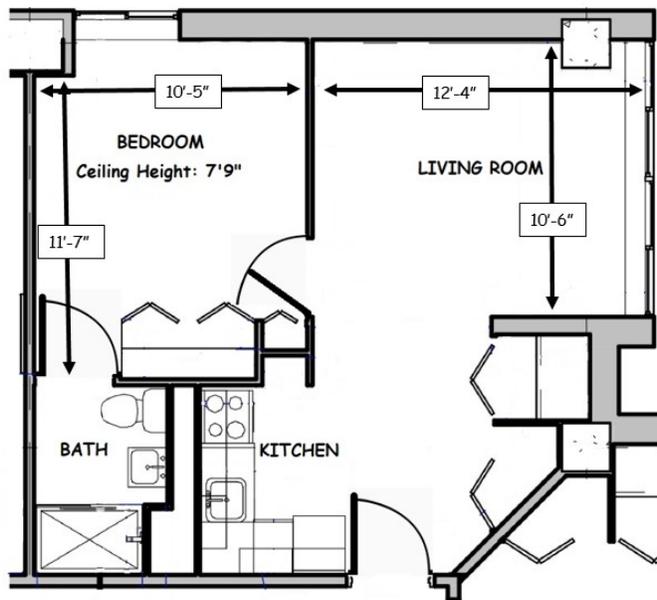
Typical apartment layout (apartment 1407 resembled this)
